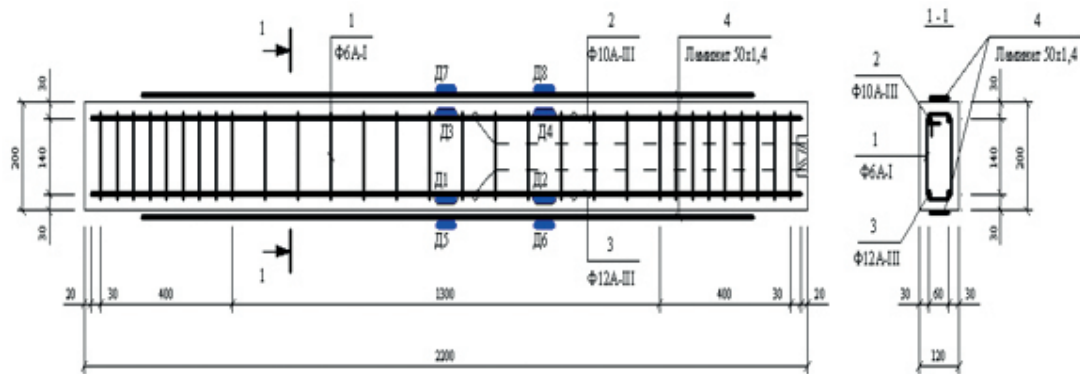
Reinforcement of bending reinforced concrete beam with reinforcement in tensile and compressed zones by laminate
